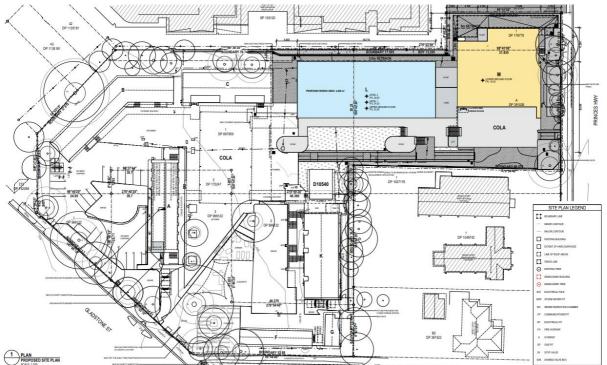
Extract of proposed Site Plan (Fulton Trotter, 2024)
